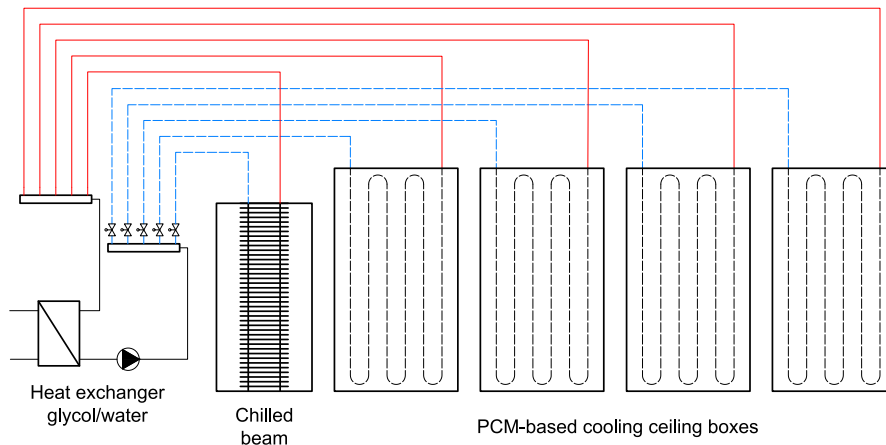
Hydraulic connection of the ceiling cooling/heating system.
